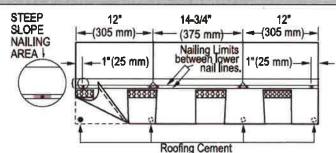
When installing Grand Manor Shangles on steep slopes, use seven nails and three spots of asphalt roofing cement.
